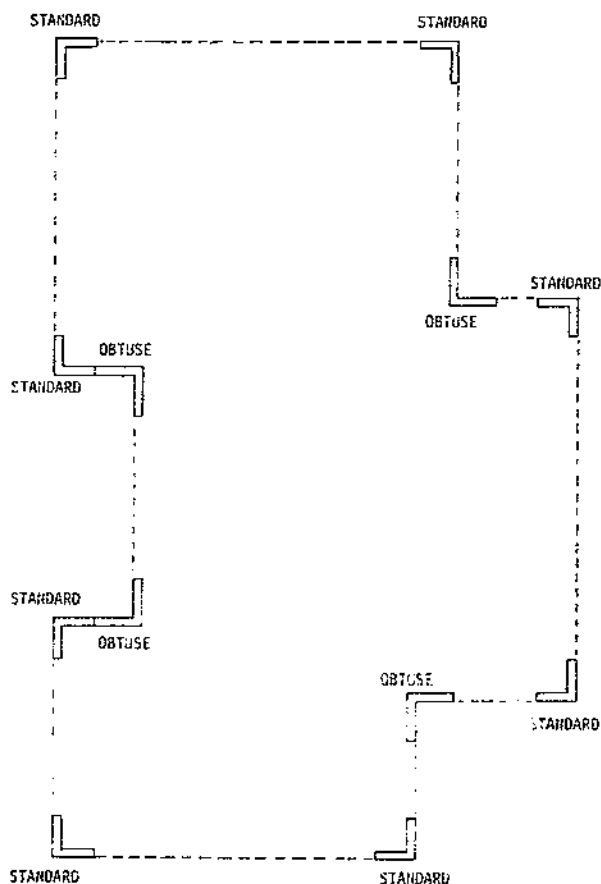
Corner-panel placement for irregular-shaped house.
